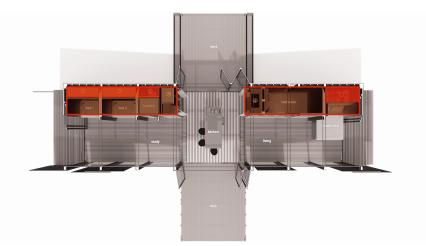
Original floor plan showing prefabricated services cores [outlined] and physical space for plant [dark red]
